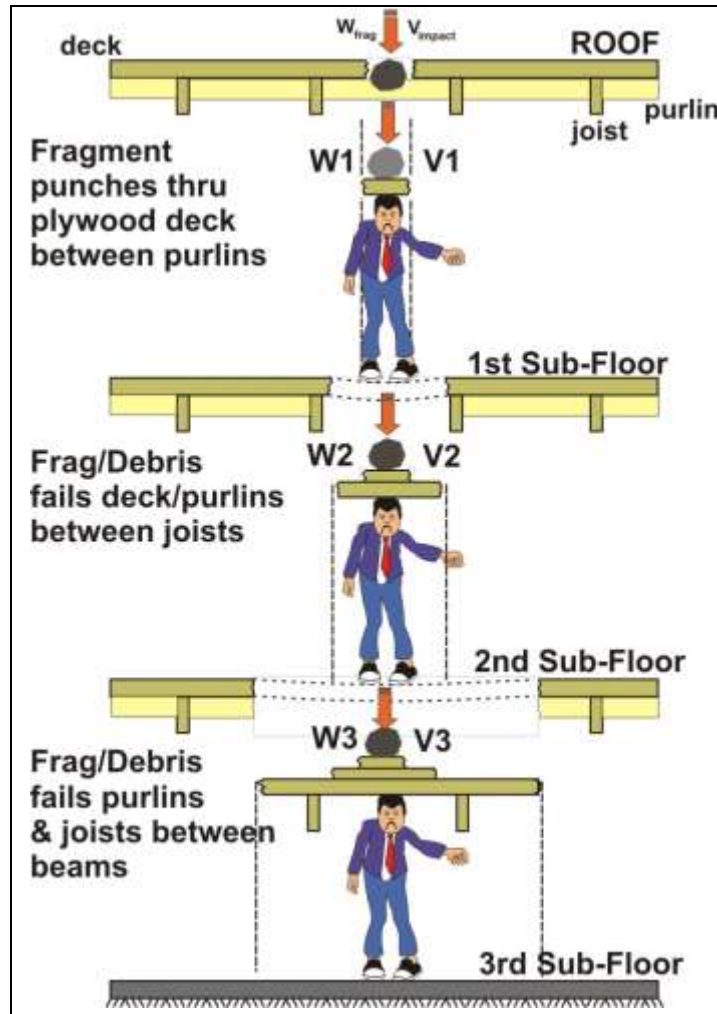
Illustration of Modeling Roof/Floor Penetration
